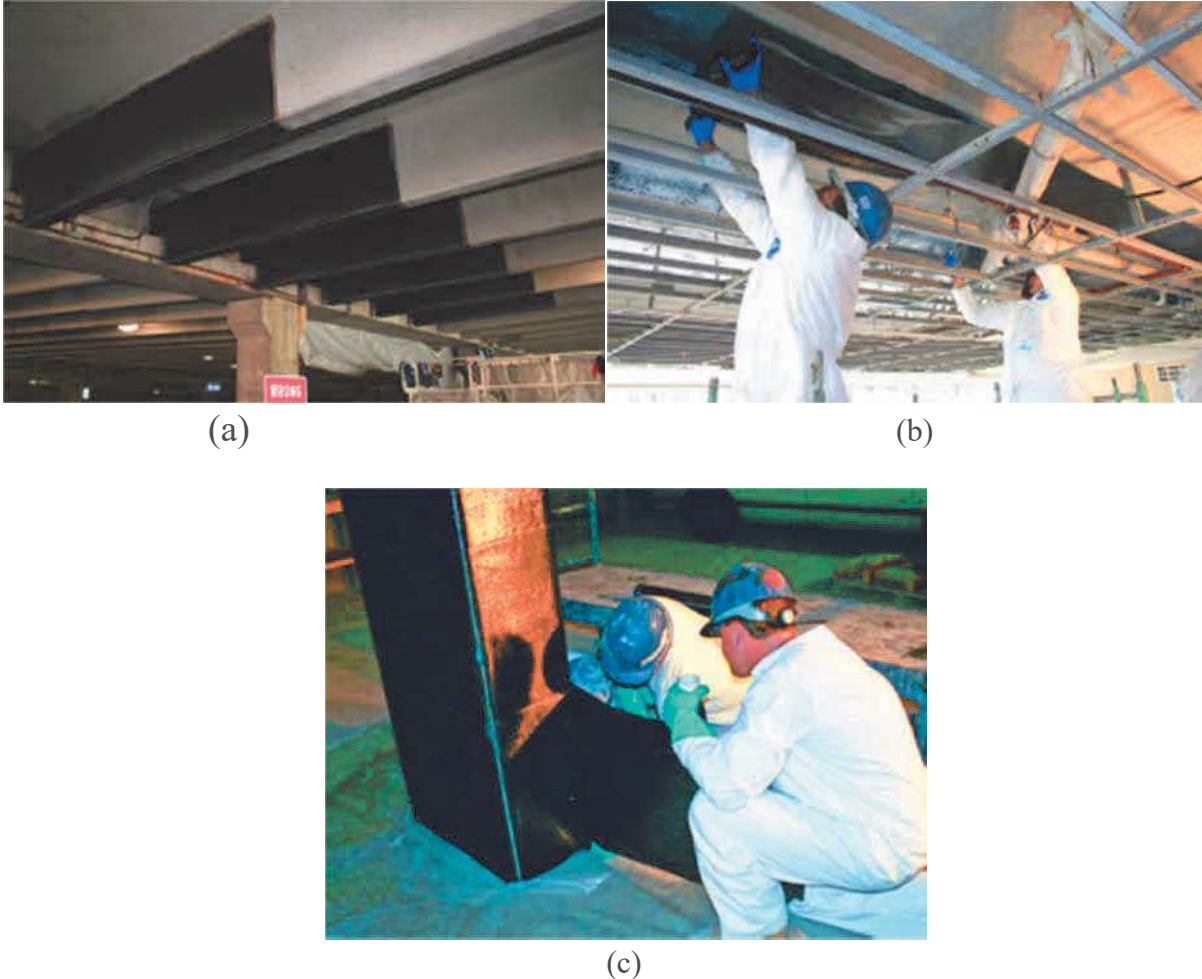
FRP Application on (a) Beams , (b) Slabs and (c) Columns.
